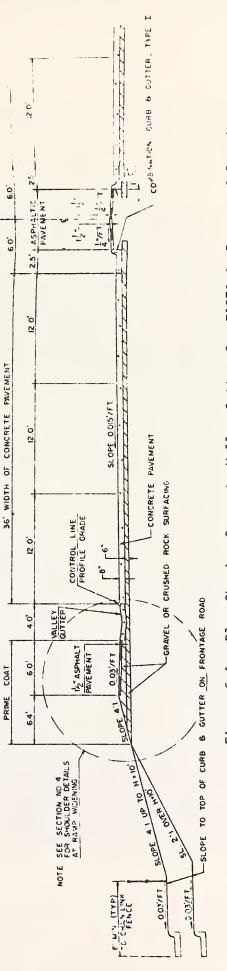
Concrete Curb and Gutter on FAI5 in Oregon.
